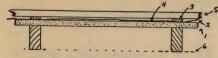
Insulation board on outside of stude (new building) (rat proof).
